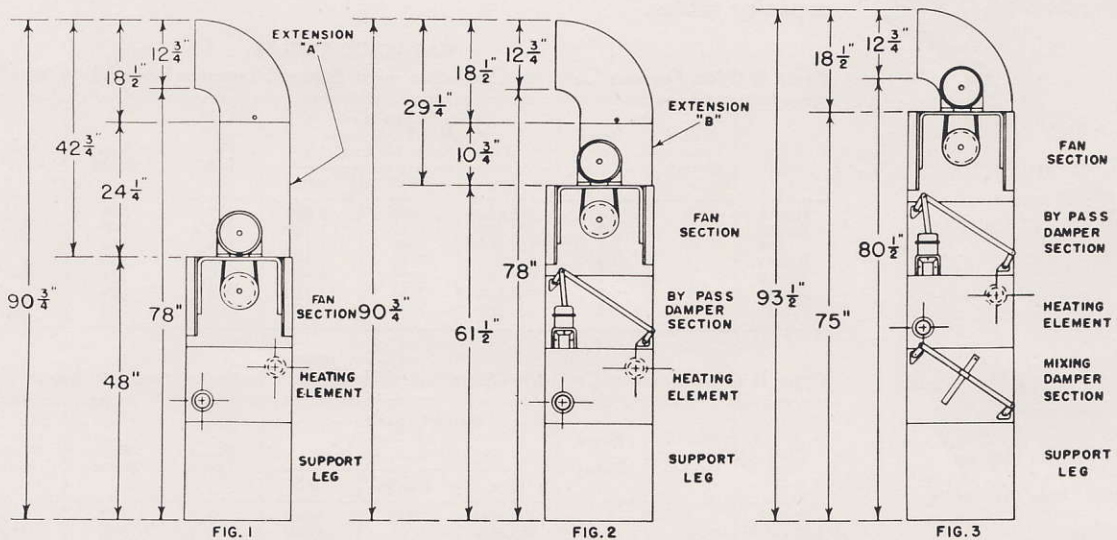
Height Dimensions 18 Series. Floor Mounted Type "R" Unit Heaters with Standard Discharge Nozzles and Extensions.
